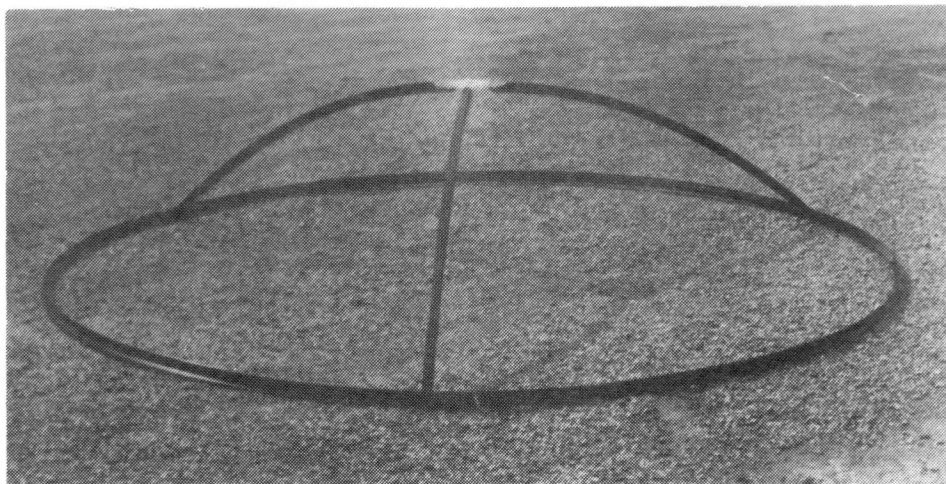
Rib and perimeter tripod. This structure will support itself while the other ribs are installed.
